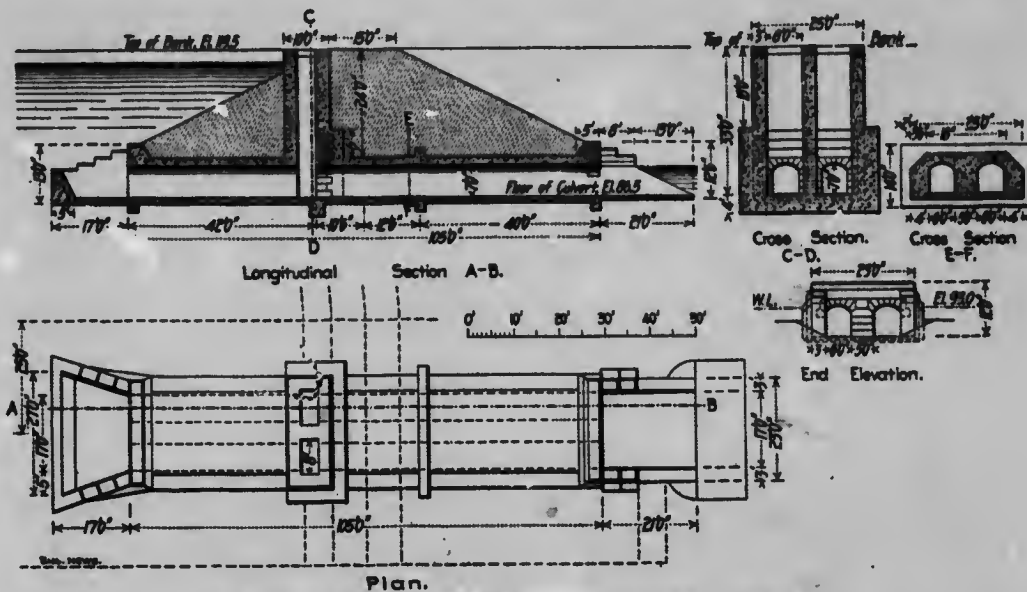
DETAILS OF REACH AND CULVERT; LOCK 2.
